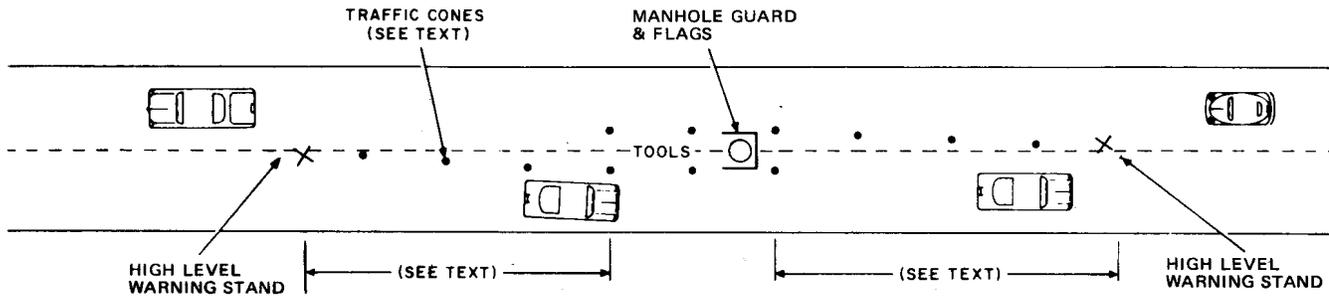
Placement of Warning Devices on City Street Without Truck - Underground Plant Near Center of Street
